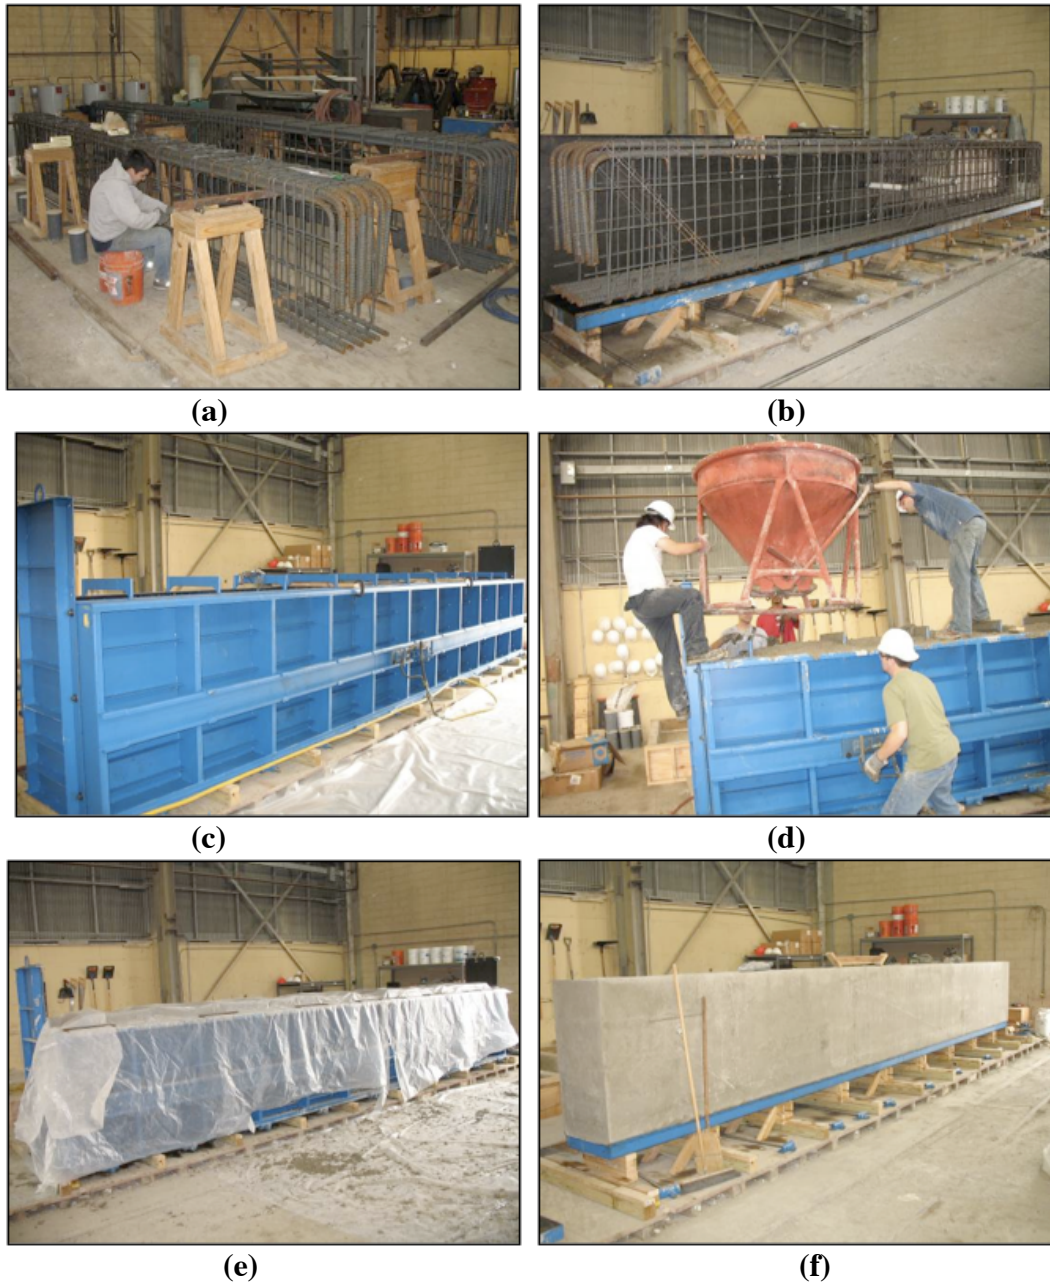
Fabrication of a typical beam: (a) assembly of reinforcement cage (b) placement of cage in formwork (c) forms in place prior to concrete placement (d) placement of concrete (e) beam curing (f) test specimen after the removal of forms.
